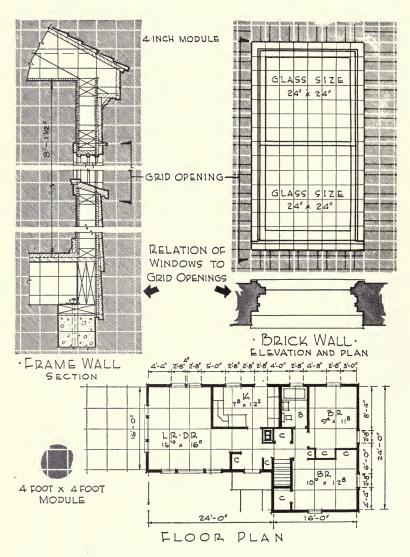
Modular co-ordination is based on structural elements that are fitted to multiples of 4 inches. The plan of this "industry-engineered" house is laid out on modular measurements. See Figure 1 for exterior view.
